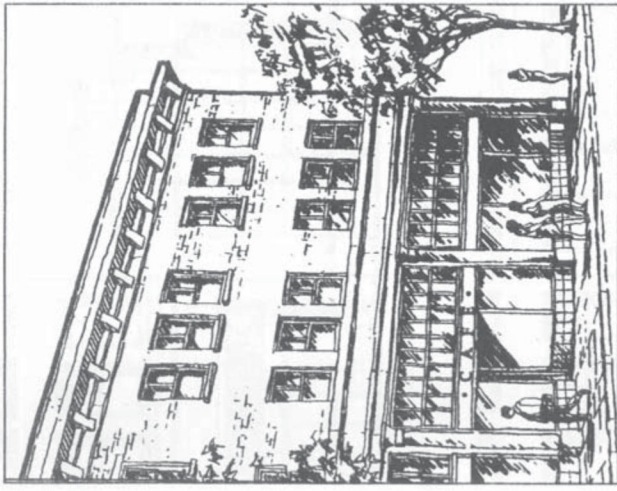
This façade composition, typical of Landmark and Significant buildings, shows how the ground floor is distinguished from upper floors, and how a consistent rhythm of storefront bays is maintained along sidewalk.
